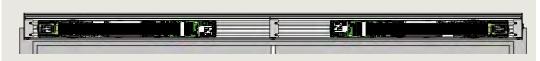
115 Vac power cable installed on operator with 115 Vac customer connection
